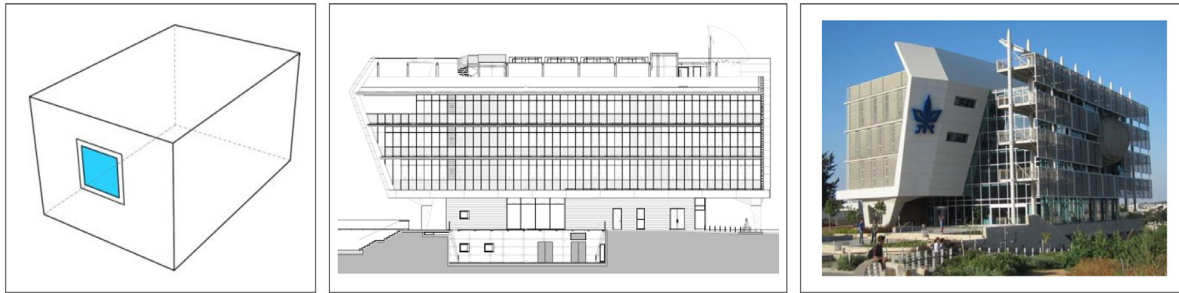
Studied space room in PSES building at Tel-Aviv University Israel (Studied window - North window, size 15% of façade).
